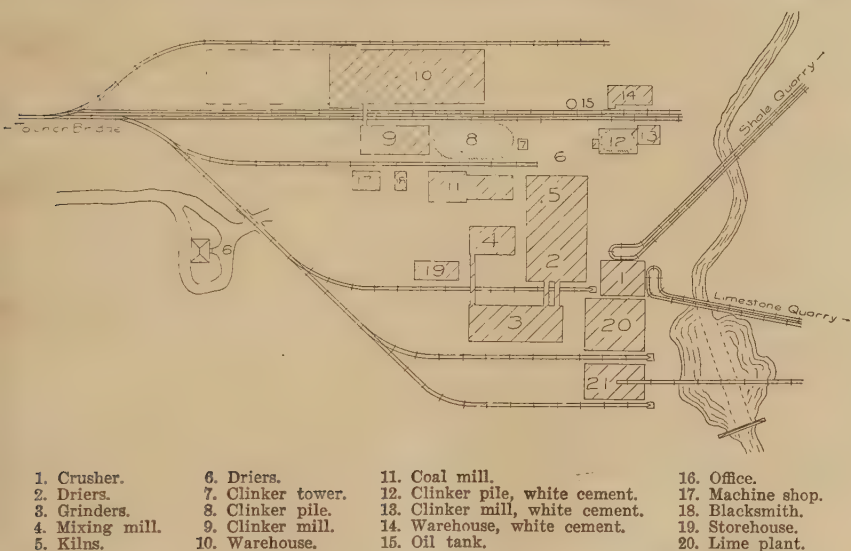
Plan of arrangement of buildings, Tidewater Portland Cement Company, Union Bridge.
